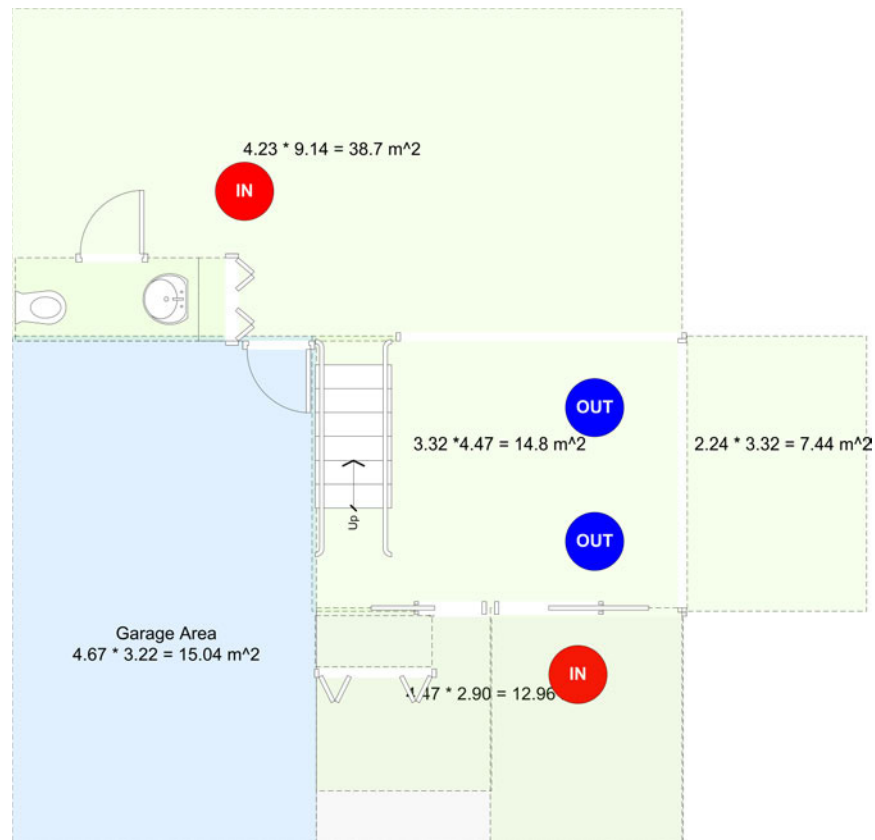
2nd level floor plan, HVAC air intake and exhaust locations
